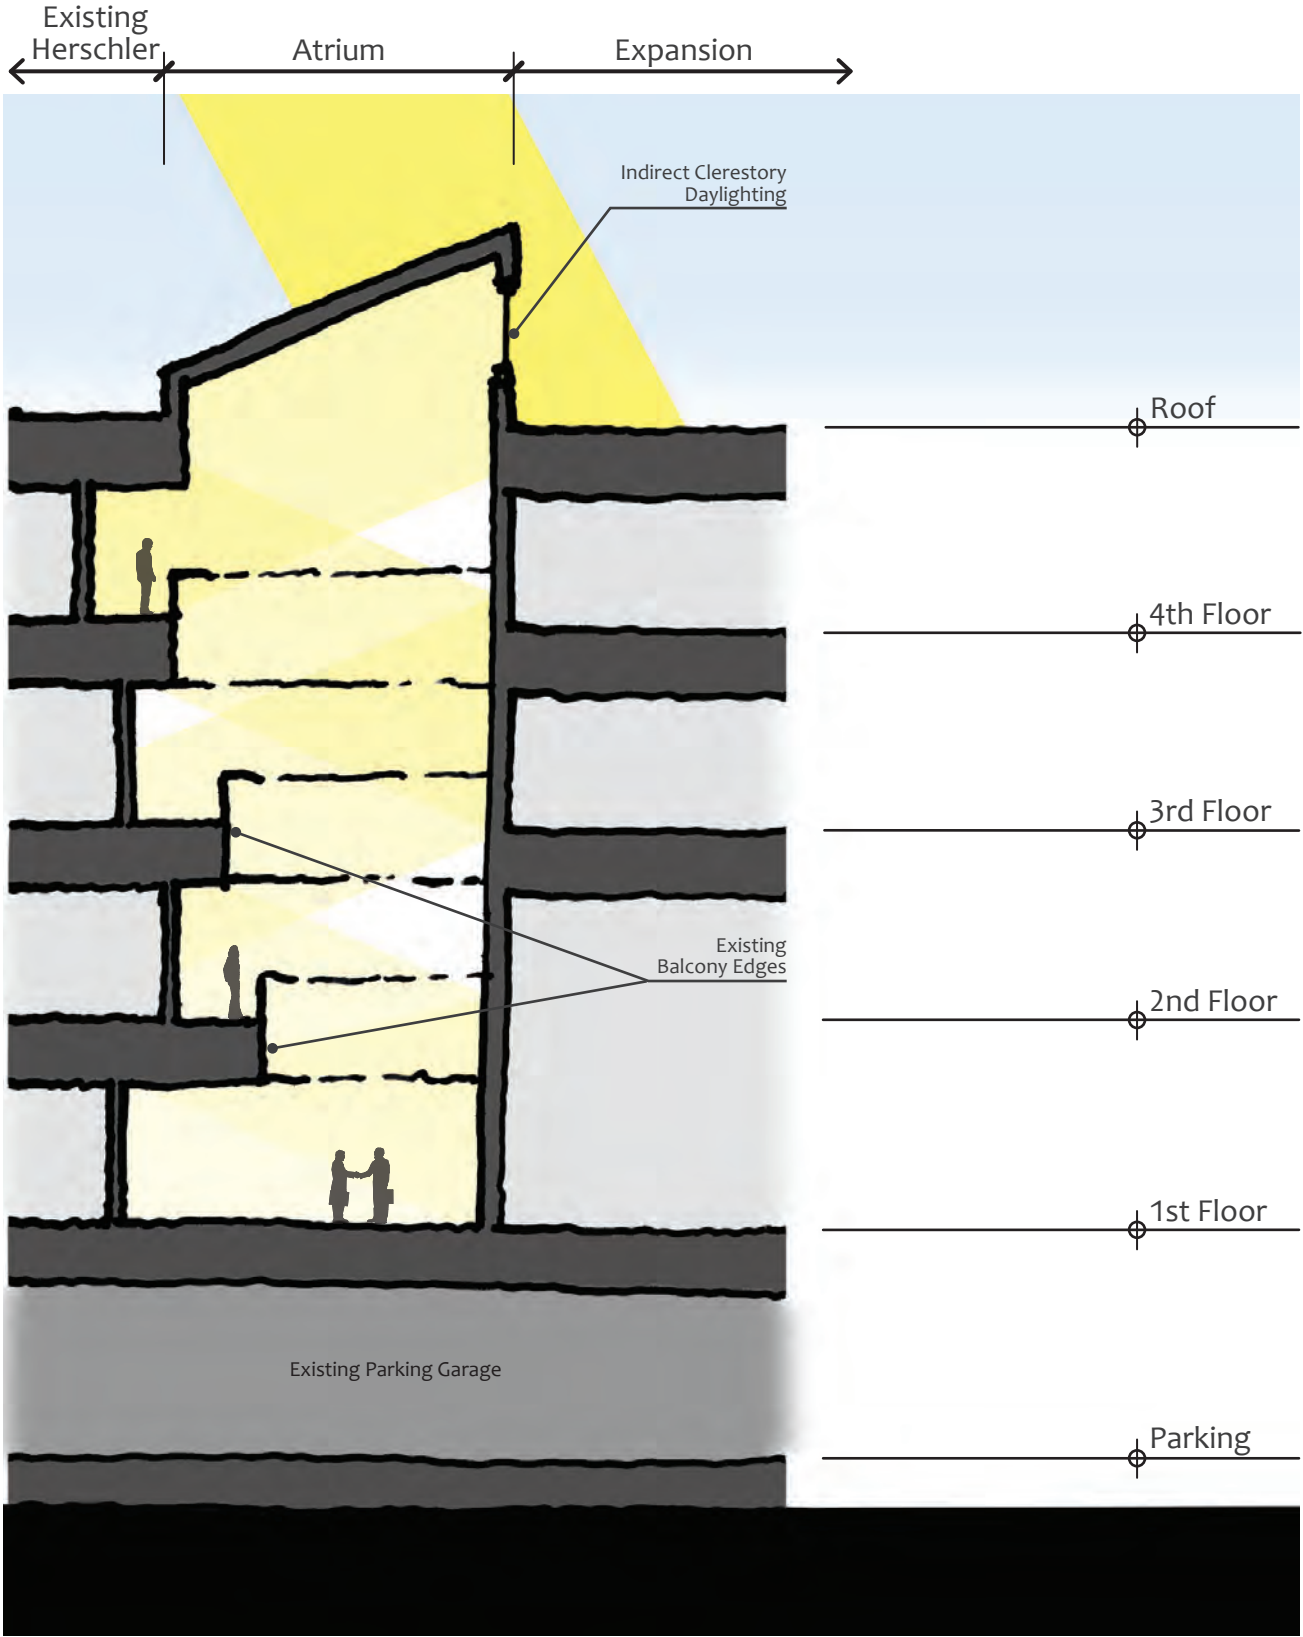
Section C-C - Through proposed Herschler Atrium
